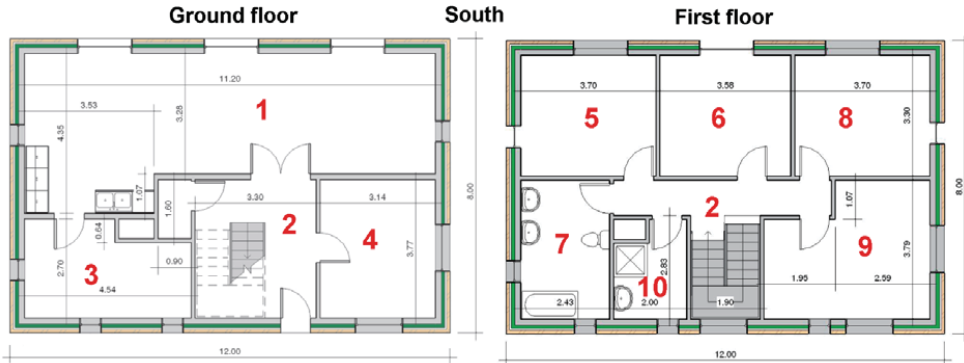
Sketches of ground and first floor of building: kitchen coupled living-room (1), corridor (2), laundry (3), office (4), bedrooms (5, 6, 8, 9) and bathroom (7,10)
